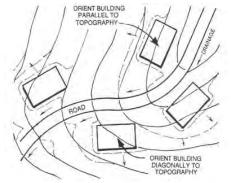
Orient Buildings and Roads. to Topography.
